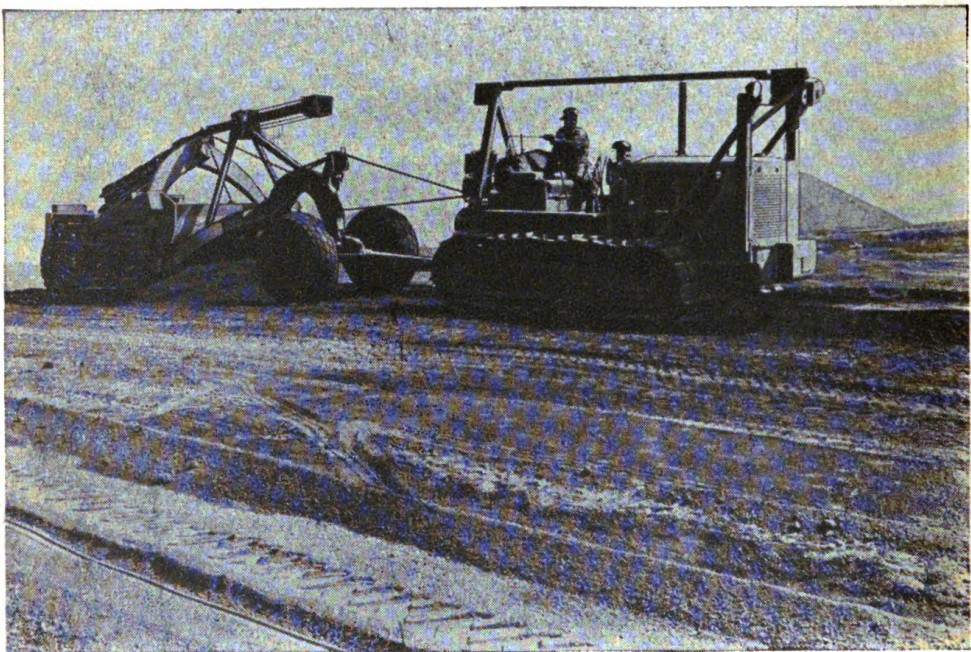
D7 tractor and 8-cubic-yard scraper excavating light soil for landing-strip embankment.
